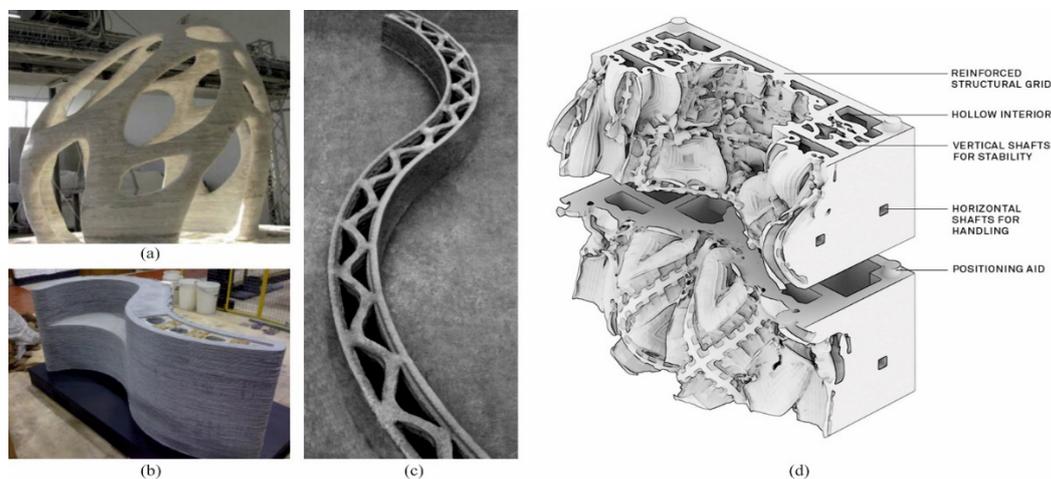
Full-scale printed structures through (a) D-shape printing, (b) concrete printing, (c) contour crafting process [43], and (d) printed digital grotesque [48].
